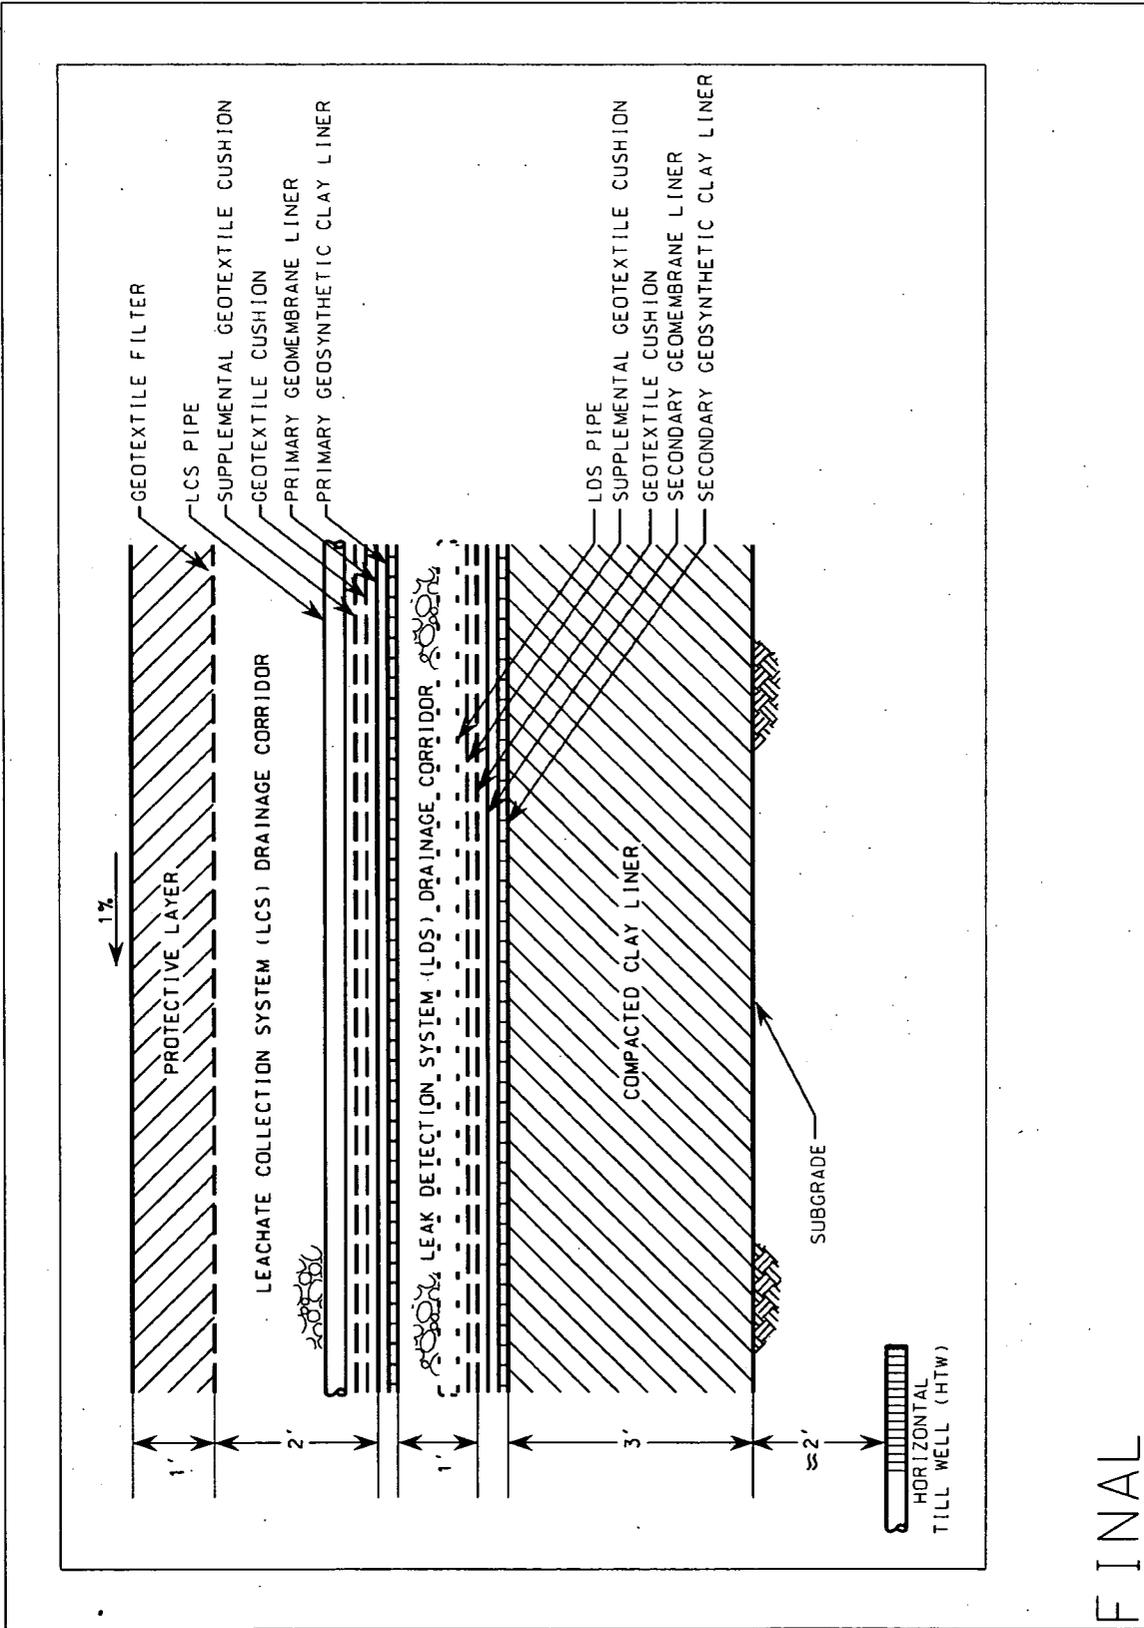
On-Site Disposal Facility Liner System with HTW at the Drainage Corridor
